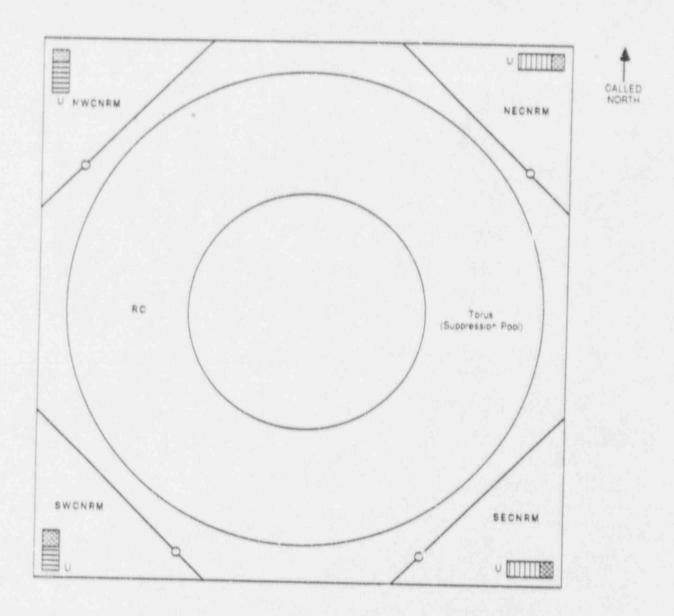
Oyster Creek Reactor Building - Elevation (-) 19'-6"
